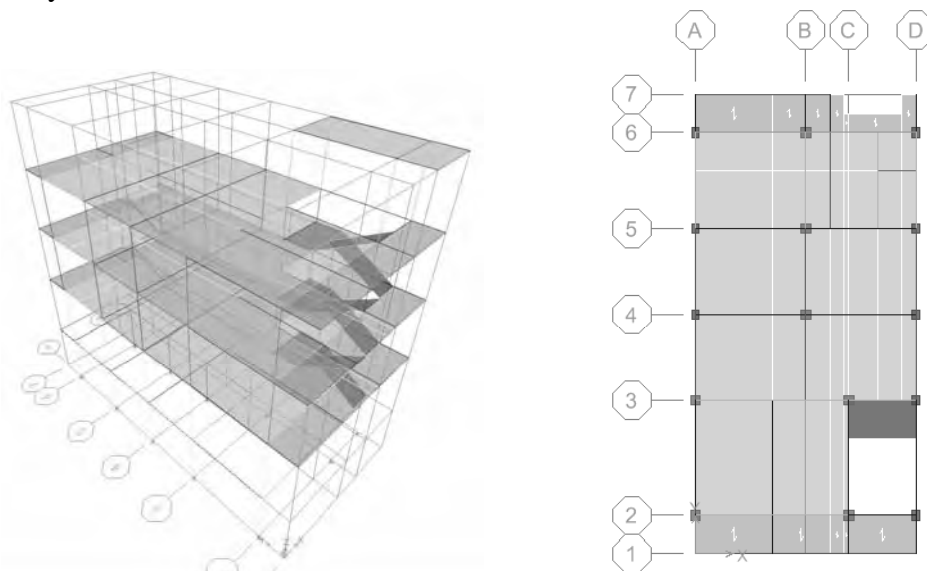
3D View and Floor Plan of Structural Model for 3stories with 1unit apartment
